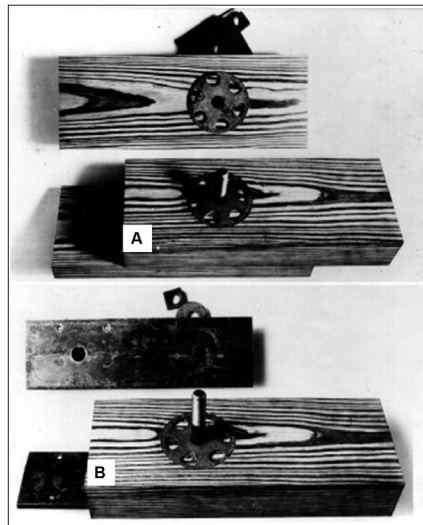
Joints with shear-plate connectors with (A) wood side plates and (B) steel side plates.
